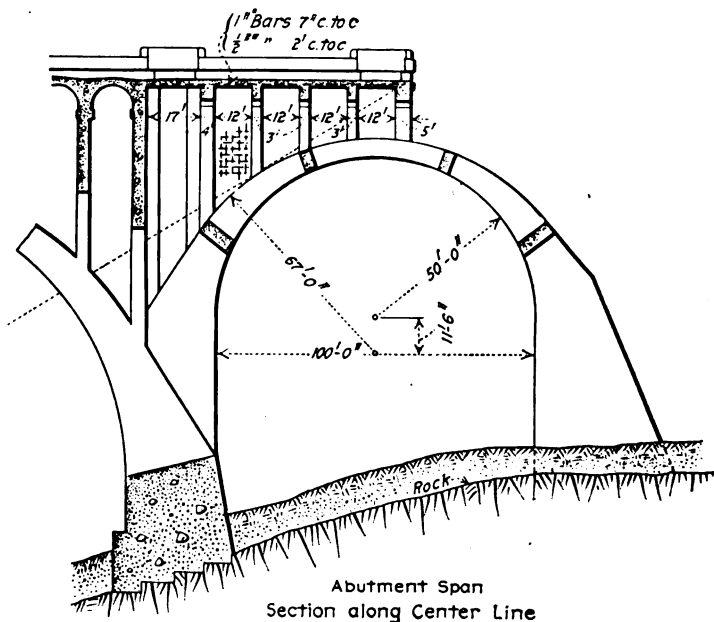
Tunkhannock viaduct. Details of 100-ft. arch span.
